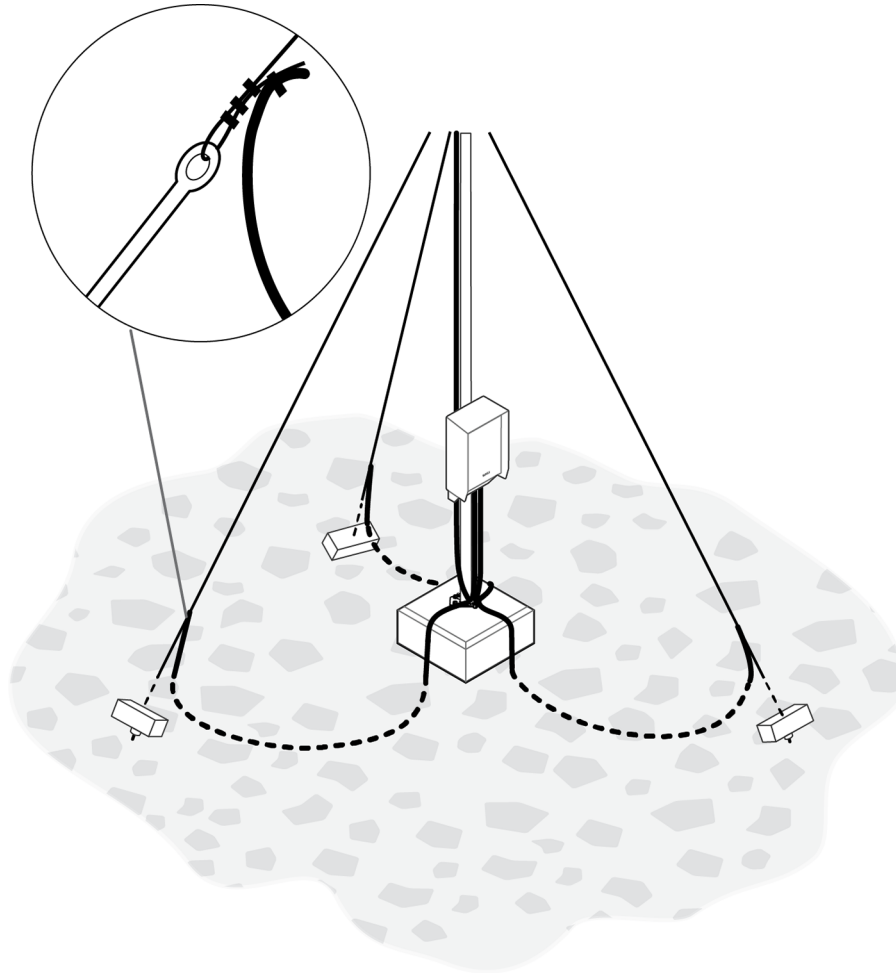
Horizontal Y-shaped Ground Electrode in Shallow Topsoil
